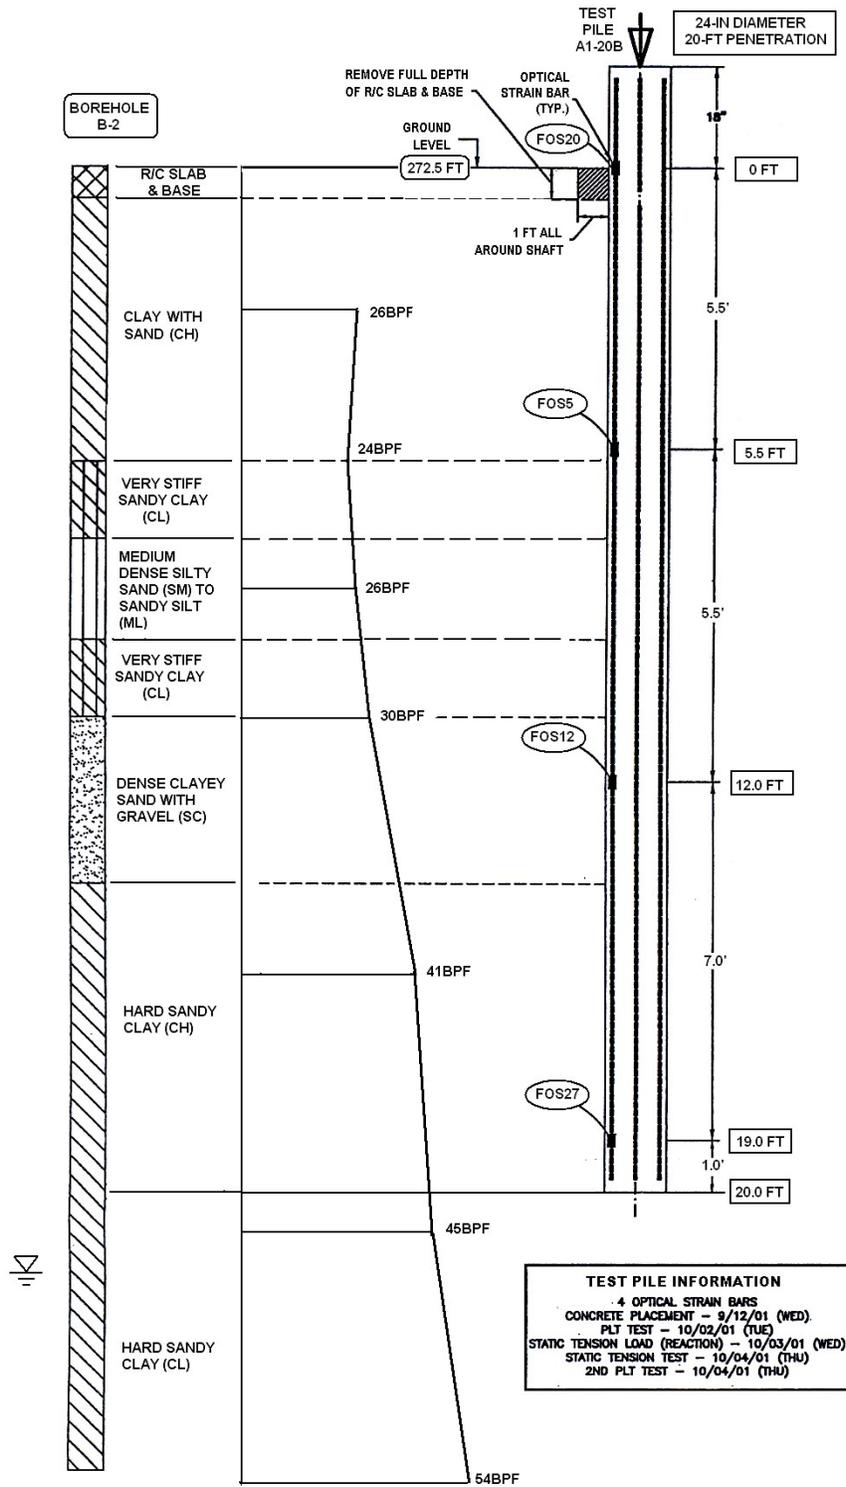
Schematic Soil Profile of Test Area 1 and Test Pier
